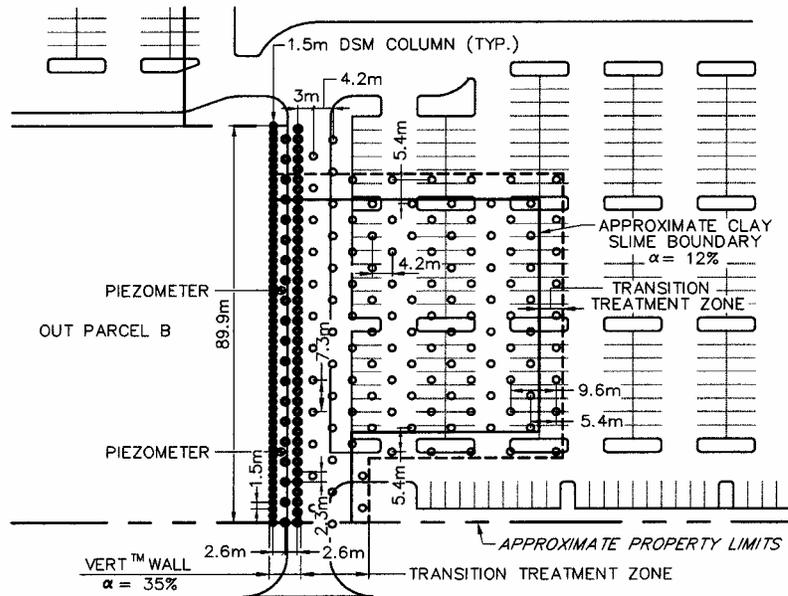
A Plan of Soil Cement Columns and VERT Wall Lakeland – Polk County, Florida
